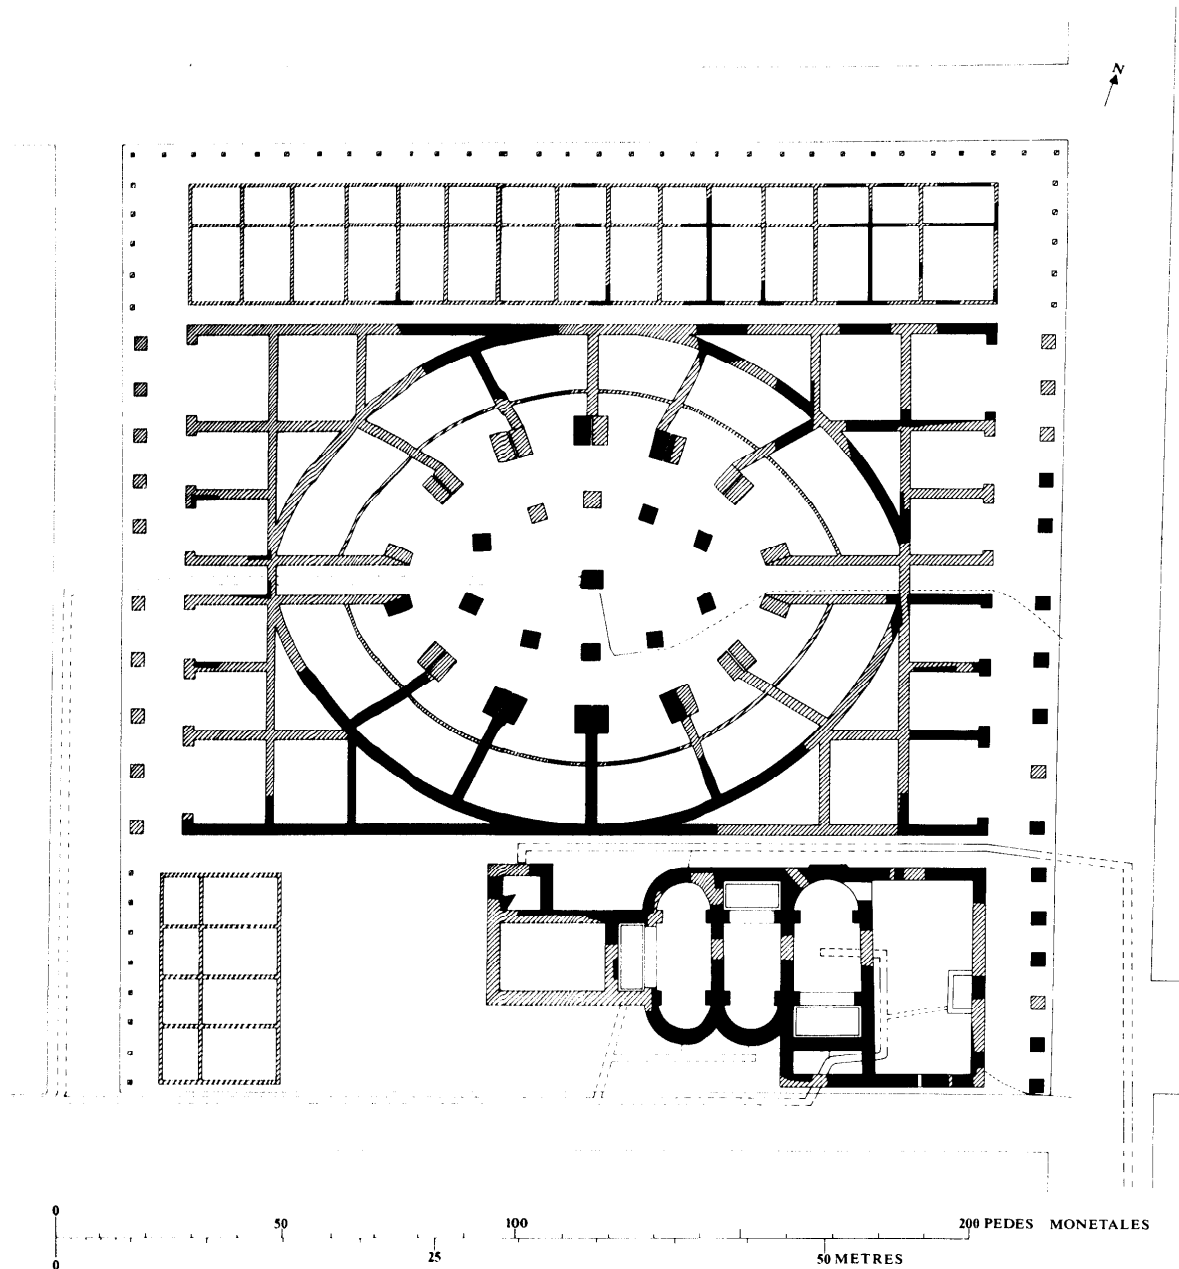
Restored plan of the Flavian Elliptical Building as begun, together with adjacent bath-building and (?)tabernae; (solid = walling/foundation found, hatched = restored)
